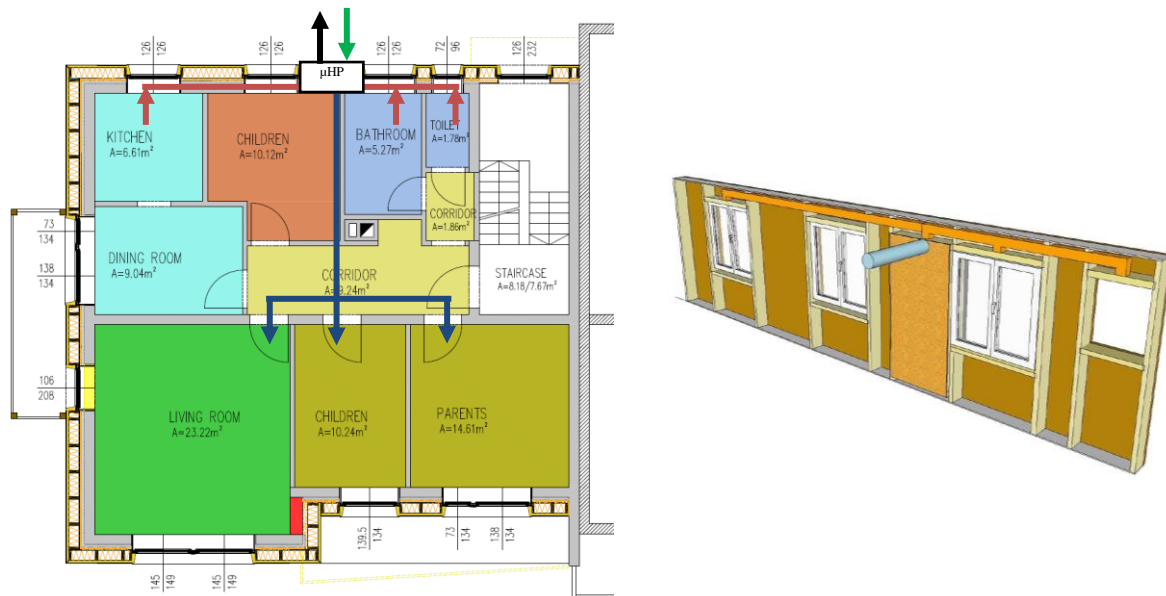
(left) Floor plan of GF of demo building in Ludwigsburg (D) with position of the façade integrated MVHR with μ HP; (right) integration of extract air ducts in the timber frame façade
